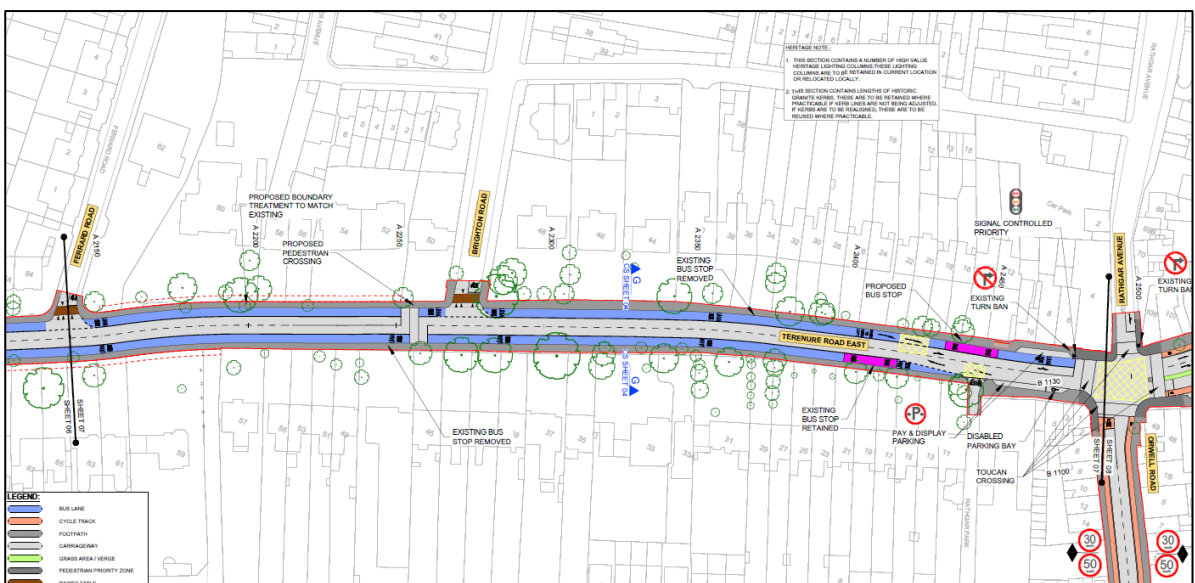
Extract from General Arrangement Drawings (Sheet 7)
